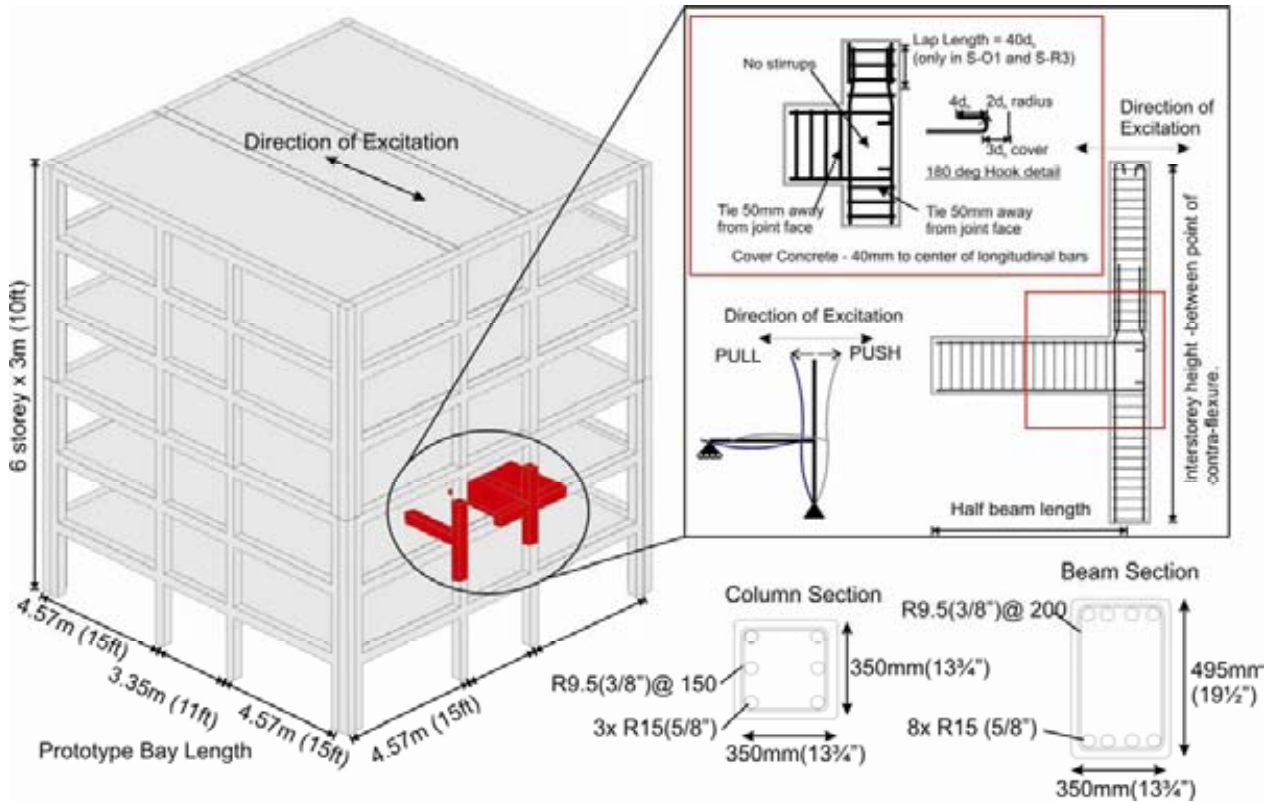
Beam-column joint test specimen as subassembly of a prototype six-storey non-ductile RC frame. Insert: beam-column joint detailing adopted for test specimens.
